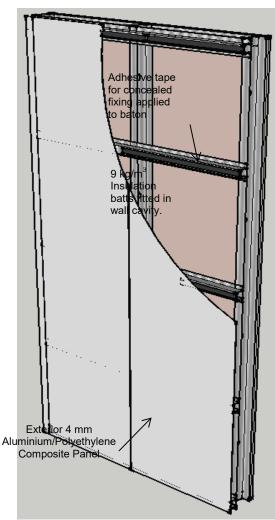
Aluminium/Polyethylene Composite Panel Façade - External Wall Cladding
